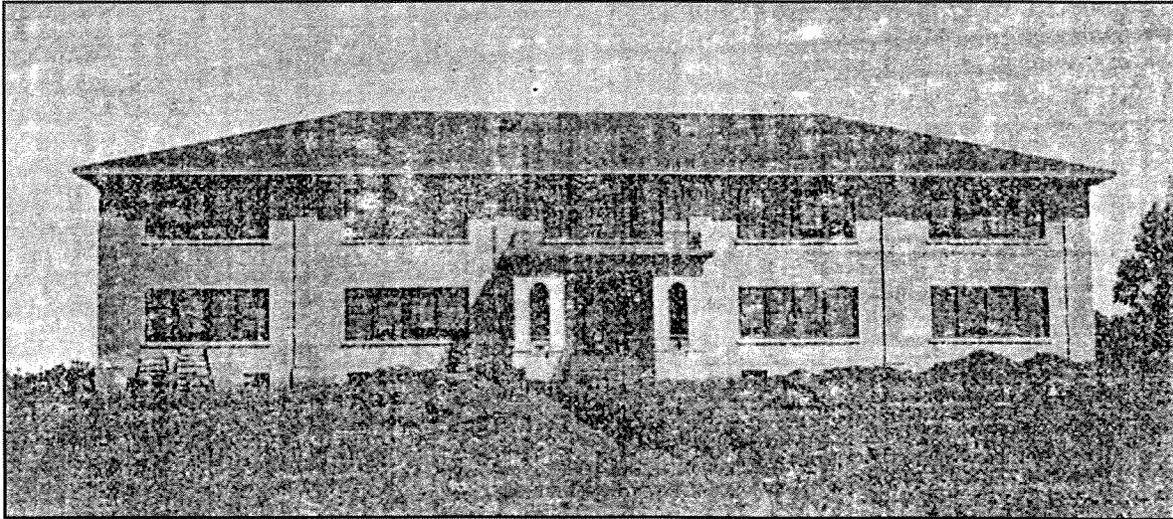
The main campus building of the Pā'ia Elementary School, under construction in 1926 (*Maui News* 12-4-26 3:1).
